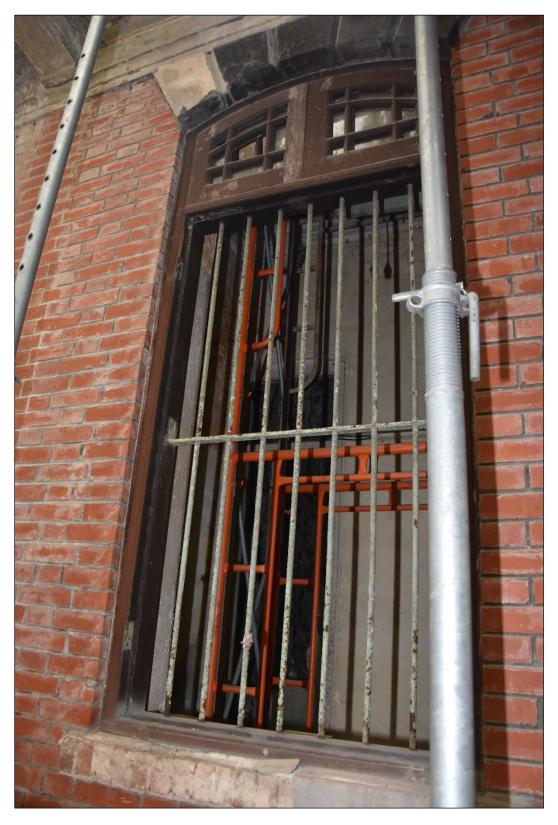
South-west elevation (rear elevation), first floor, window Wdw-1f09 at balcony, external side, (22<sup>nd</sup> March, 2023)
